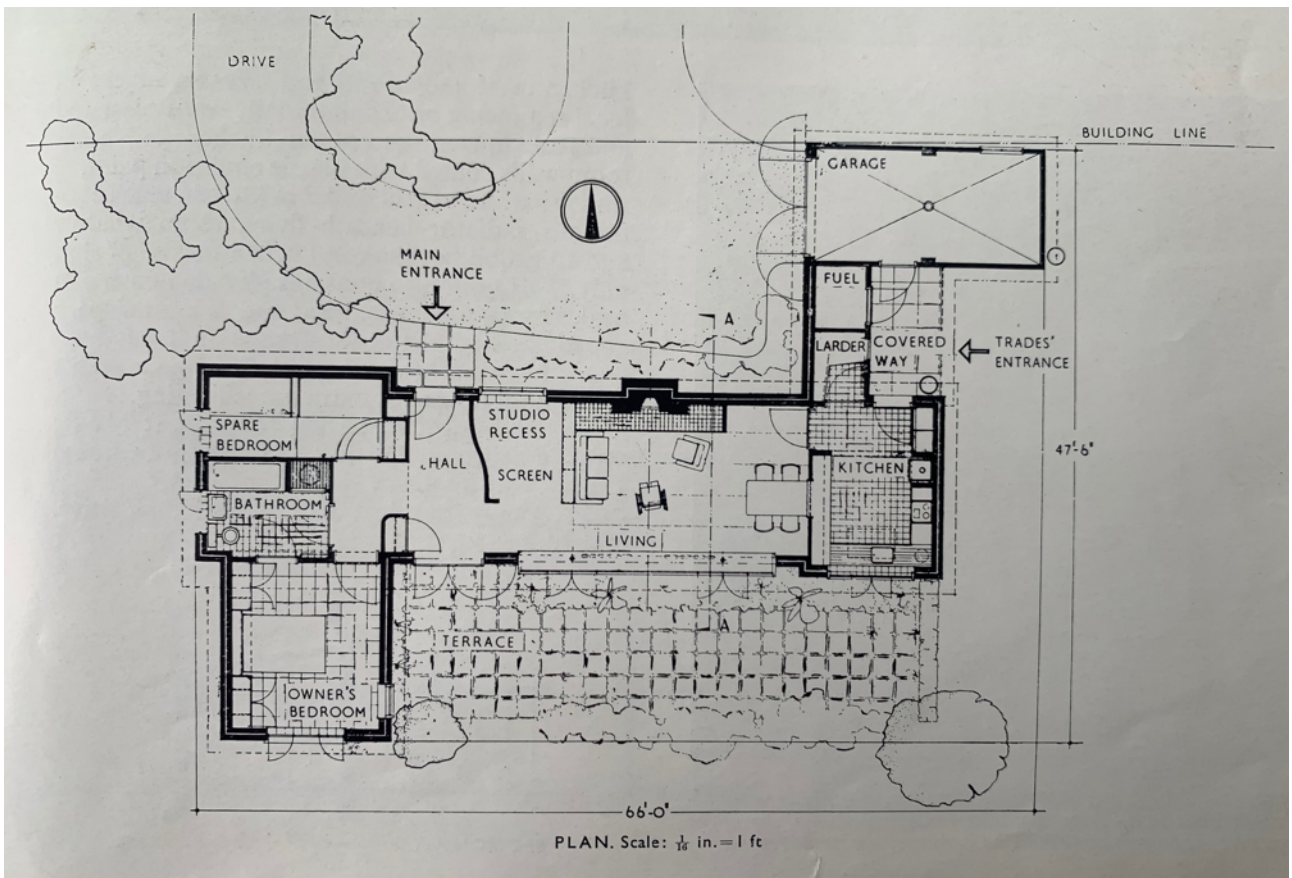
, Paules Fenn, floor plan, c1955. Reproduced from '50 Modern Bungalows' by Felix Walter. An early and important plan designed to suit the needs of a wheelchair-bound client.
